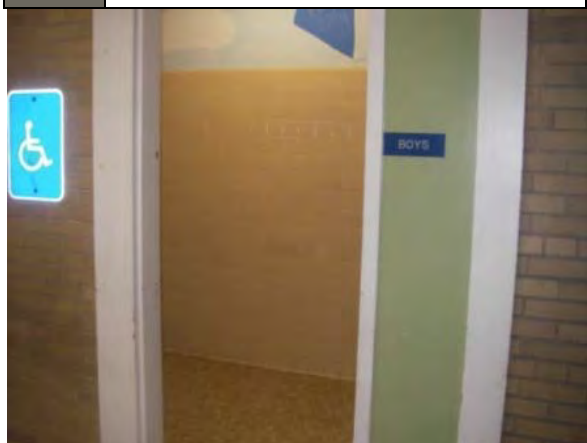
1902 BUILDING BOY'S RESTROOM
